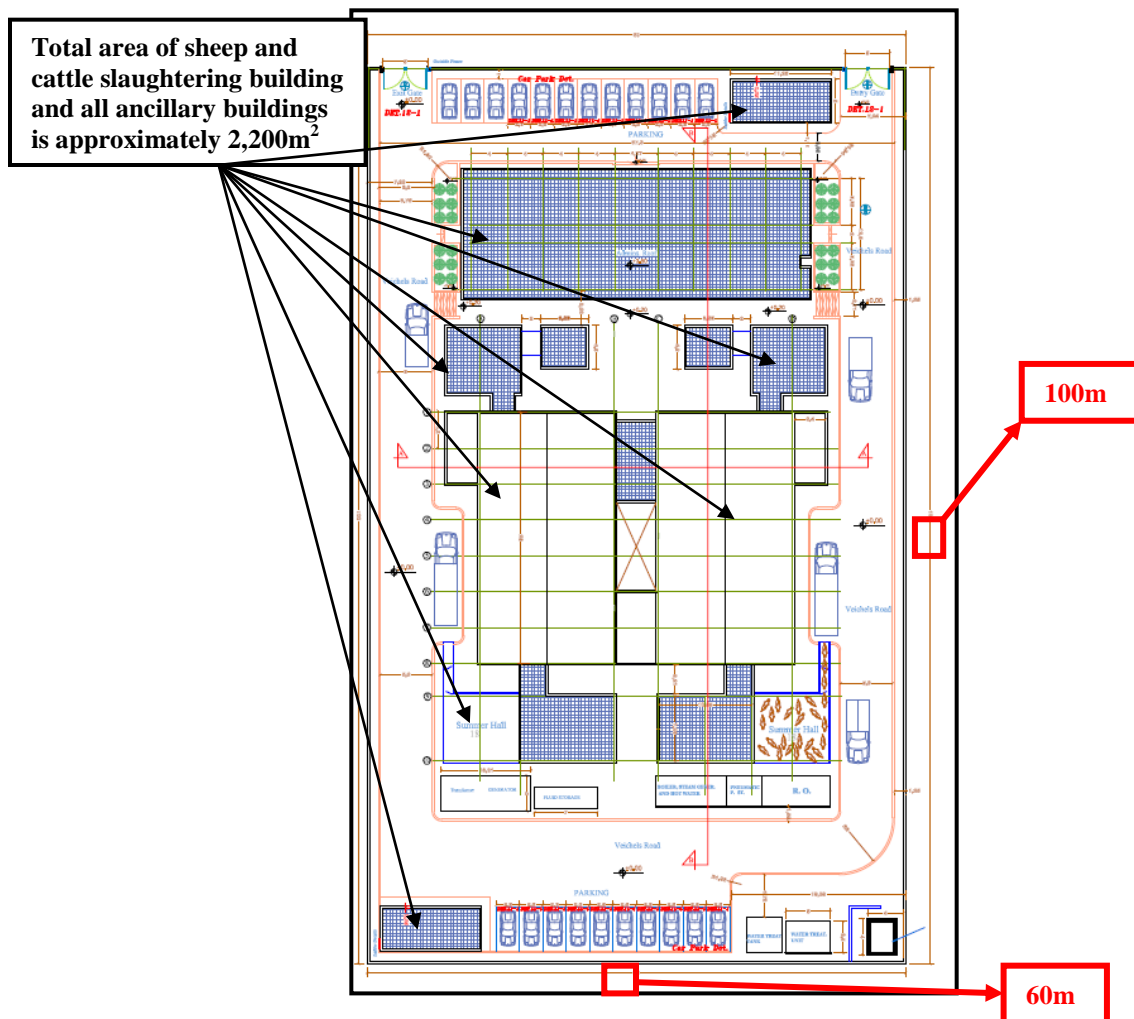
Contractor site plan with length and width dimensions (Courtesy of GRS)
